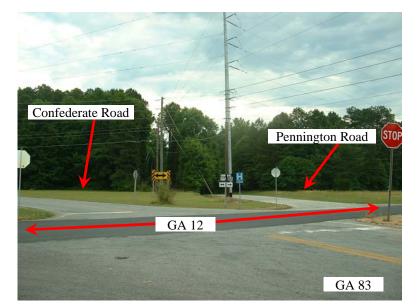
Looking North Toward Confederate Road and Penningto
